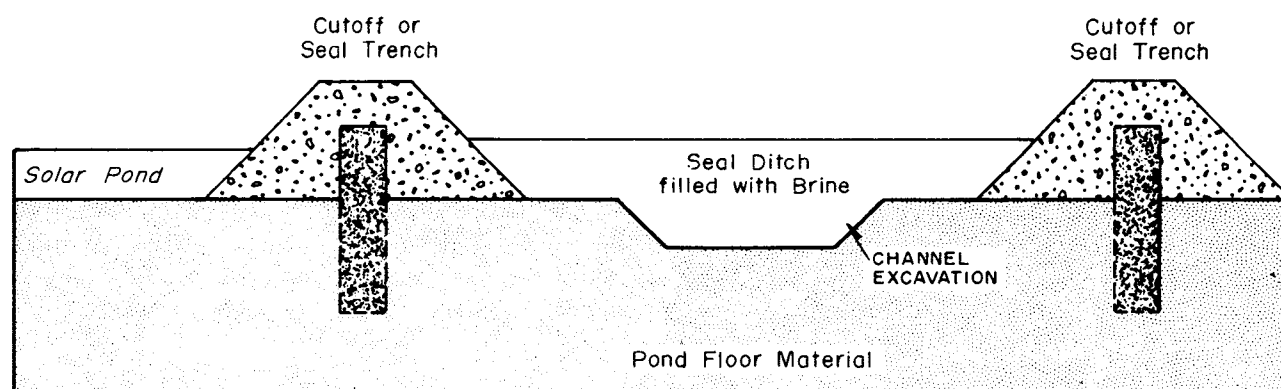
Schematic cross section of typical hydrastatic seal ditch. Modified from Ecton and MacDonald, 1962.
